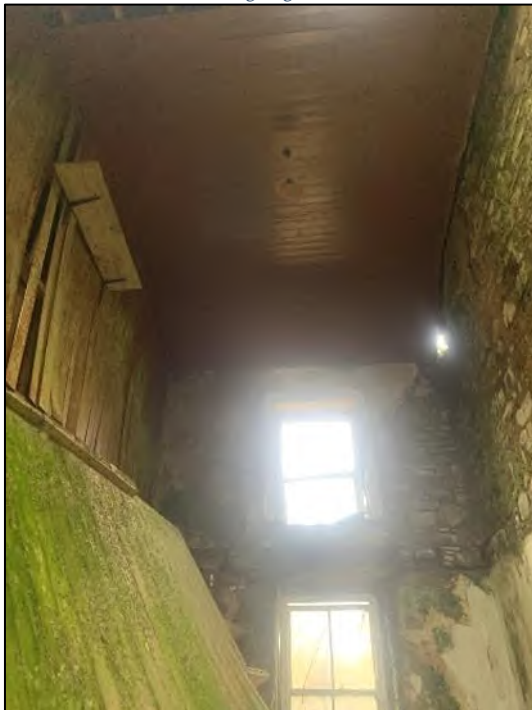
Ceiling view from the ground floor – Entry point to access the interspace between the wooden board on the top and right side of the picture.
